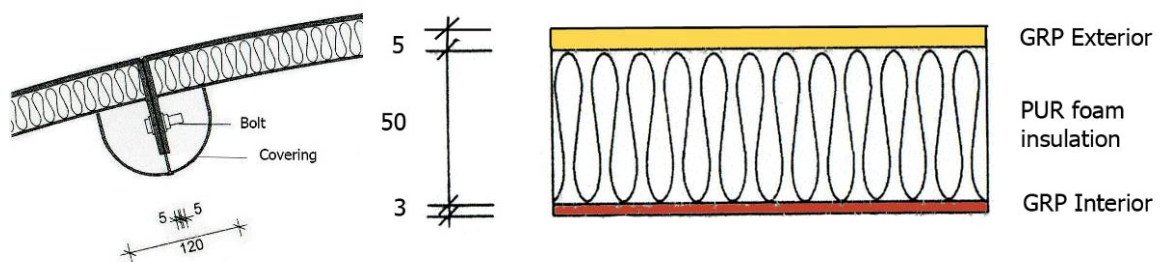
(left) Cross-section of the wall structure demonstrates the bolting. (Genzel & Voigt 2005)
